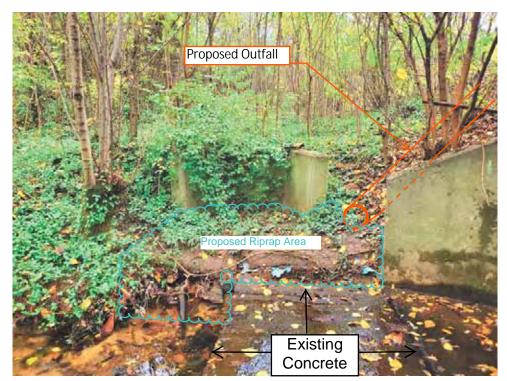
Investigation Area 1; view of the southeast quadrant of the US 31 crossing of UNT to Silver Creek; proposed new storm water outfall and riprap area noted
